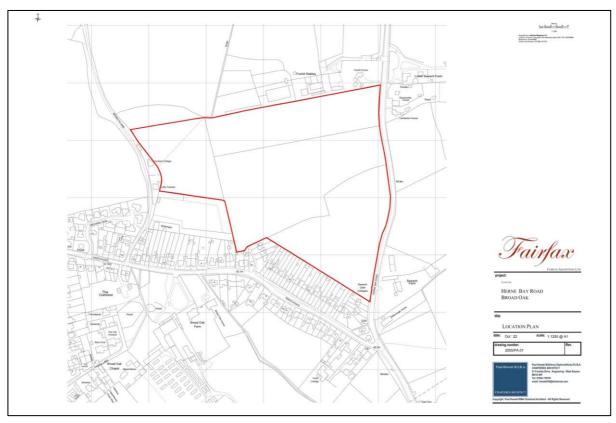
Site plan of Broad Oak, provided by Fairfax Properties.
